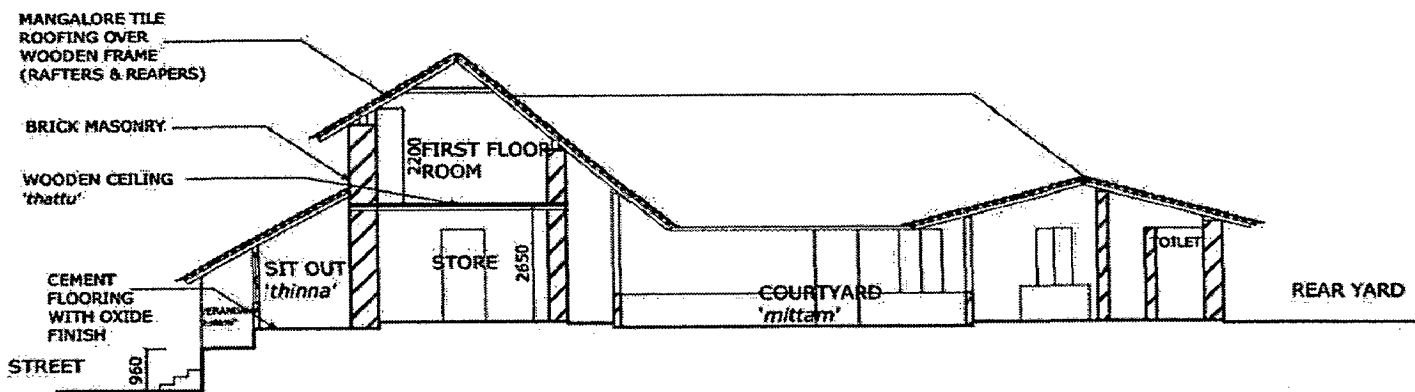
Longitudinal section of residence 2, in Kizhakkencherry Agraharam
